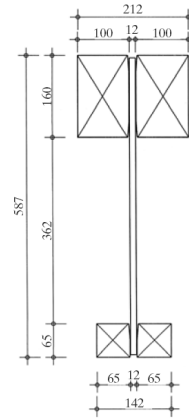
Section of the glass-wood beams applied at the Hotel Palafitte. A thermally tempered 12 mm single sheet of glass was used.
